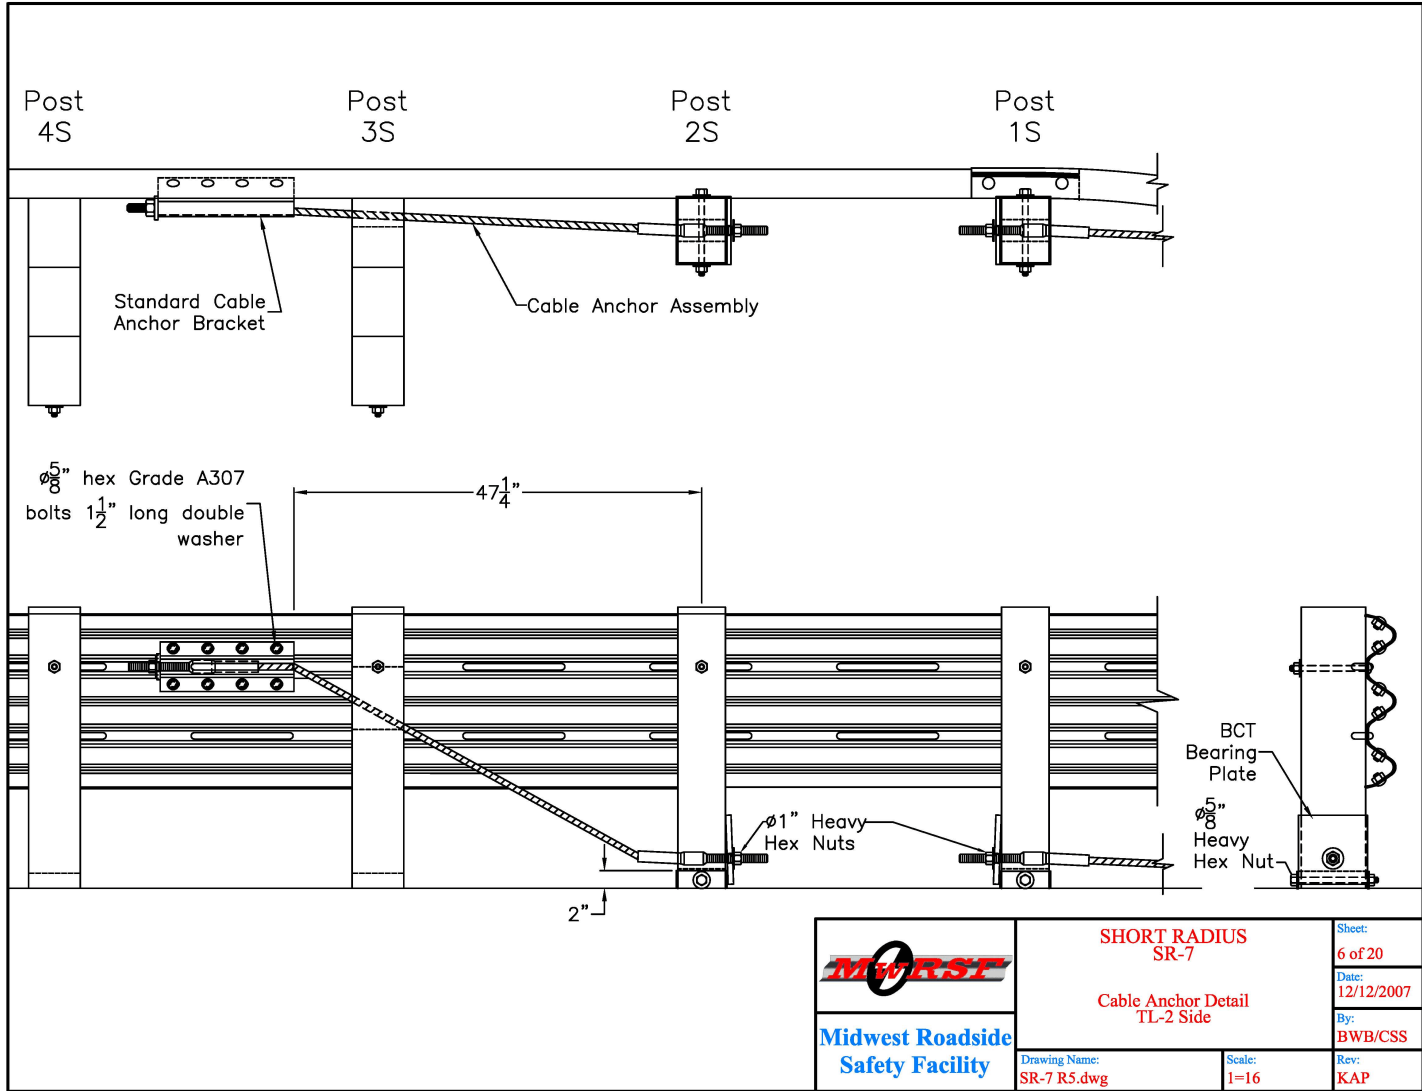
Cable Anchor Detail, Secondary Side (English)
